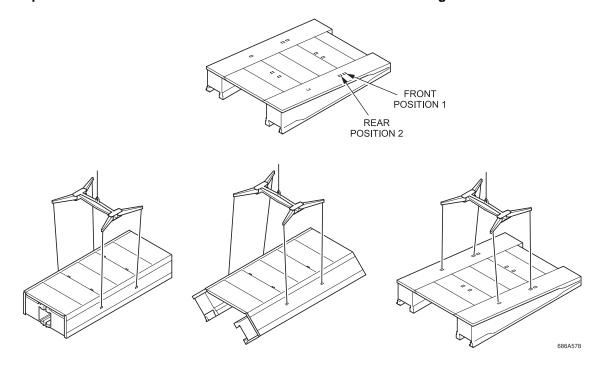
31 Bridge Module Lifter Fitted to POSITION 2 and Opening Ramp Module
